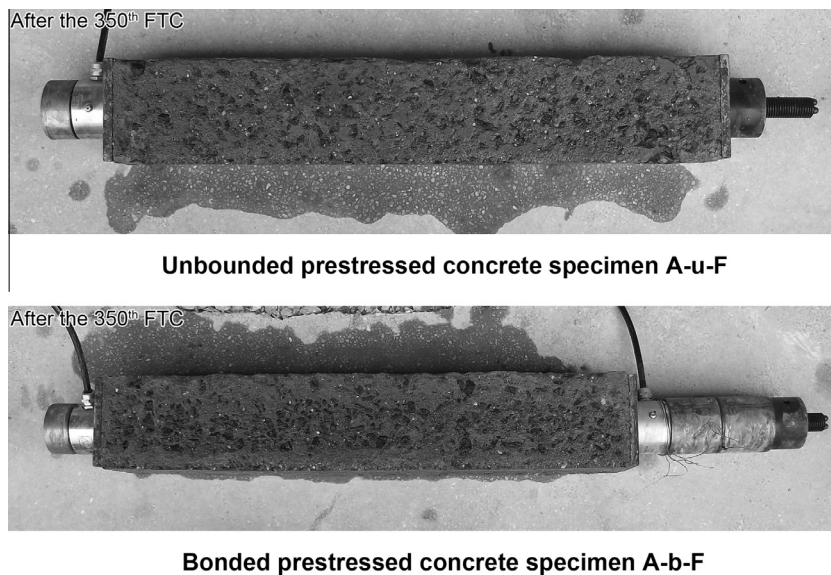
Freeze-thaw damaged prestressed concrete specimen.
